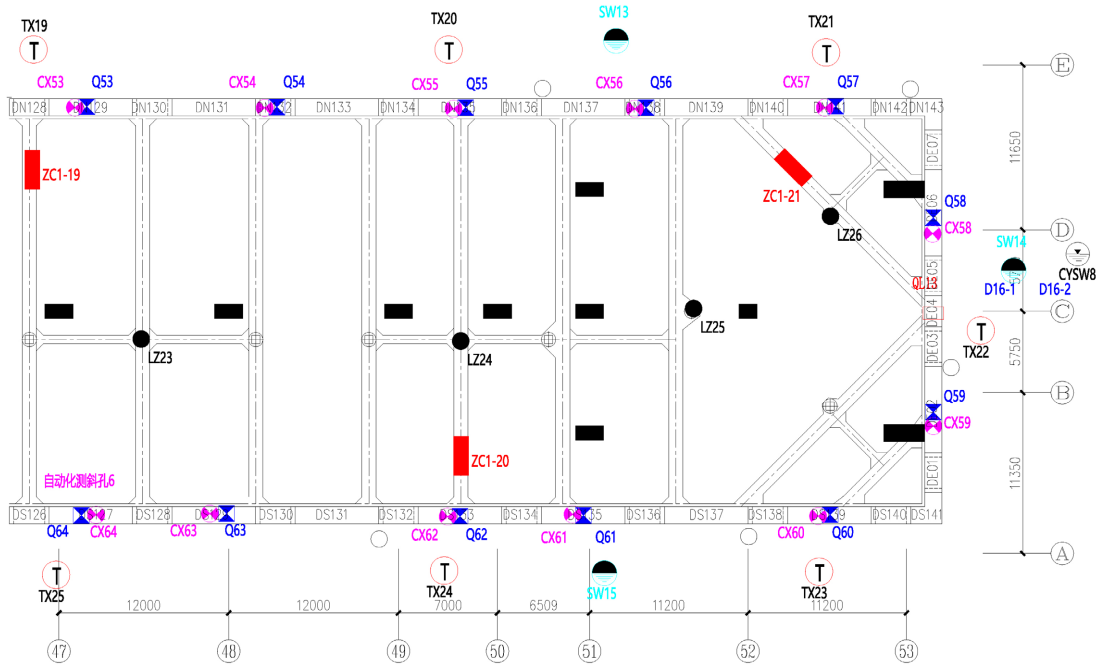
Layout of monitoring points for the foundation pit (falling depth section and east end head well) in zone 1 of Huajing station
